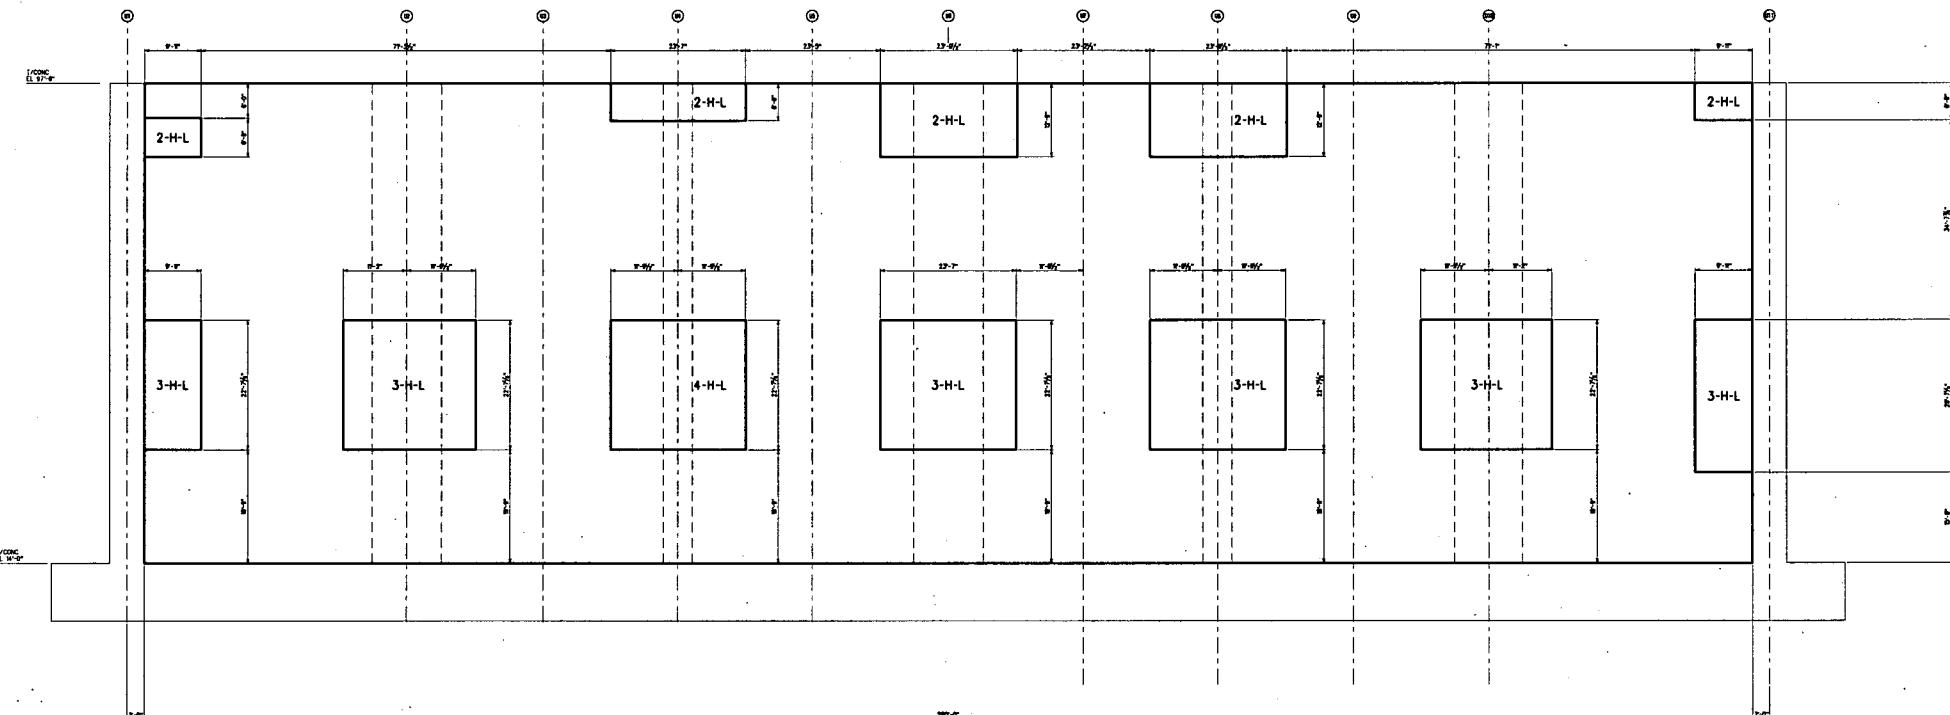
H6-89: BASIN SOUTH WALL LOOKING NORTH
